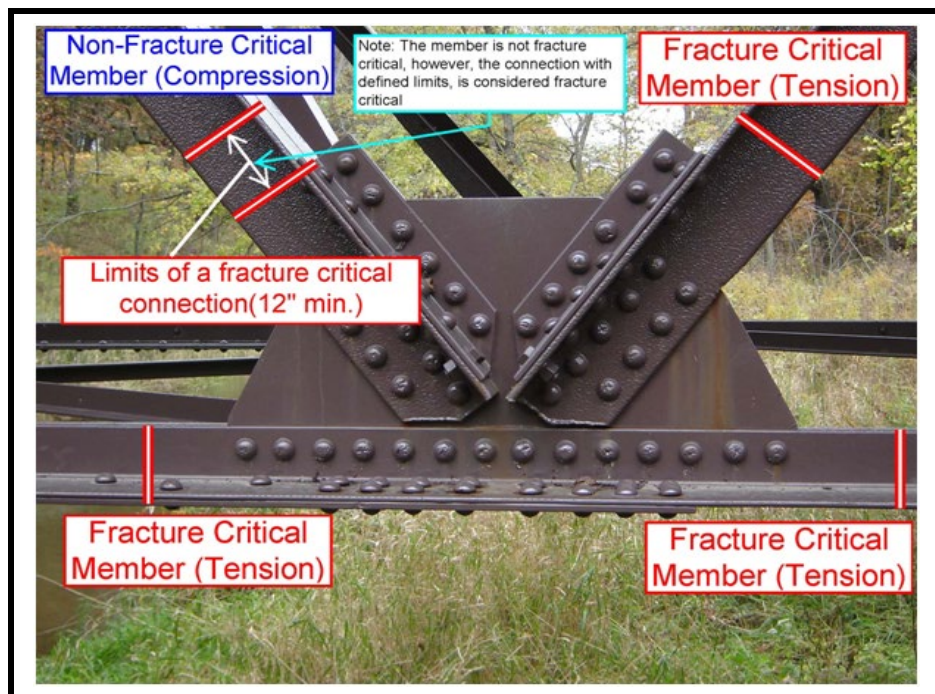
4-1: Fracture Critical Truss Connection
